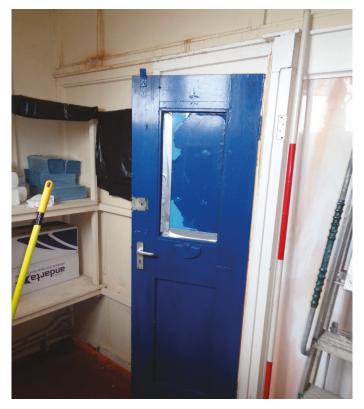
Room G2, facing south-west. Note location of previous hinges to right of current door. Scale 1x2m
